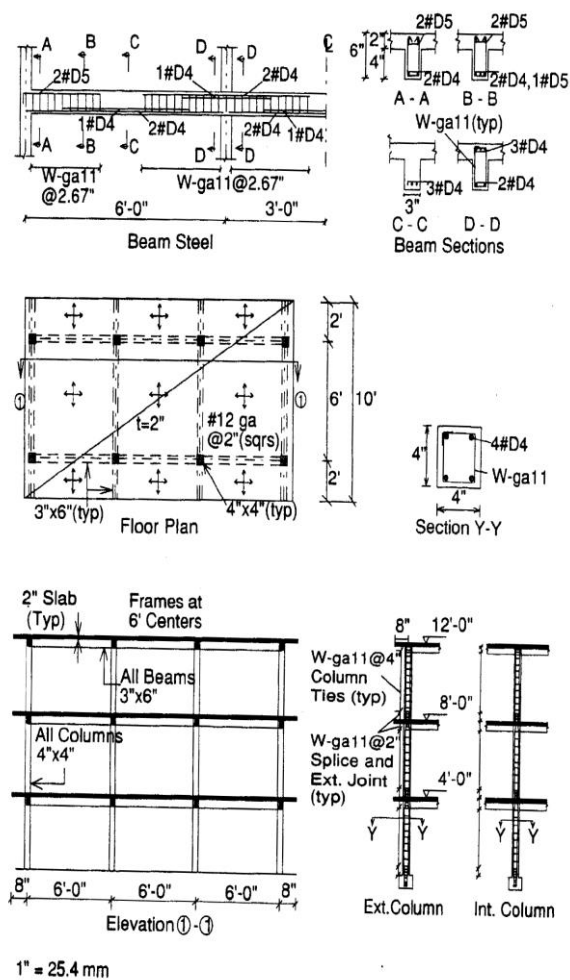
Dimensions and reinforcement arrangement of three storey frame (Bracci, et al., 1995)
